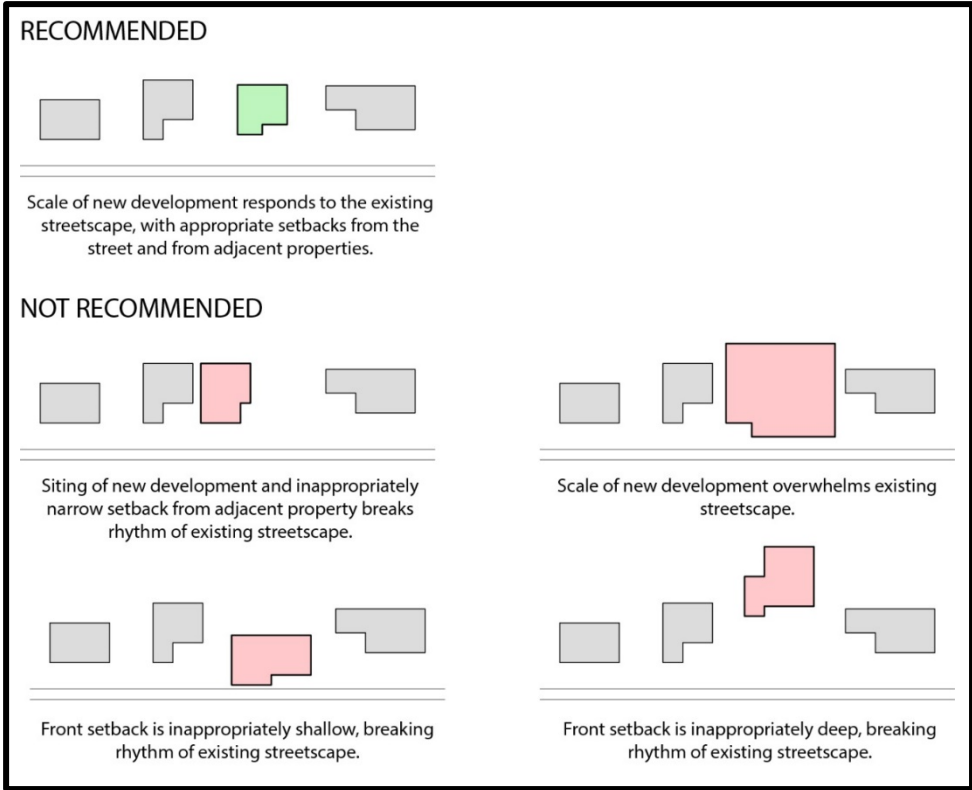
Guidelines for Siting New Development Within the Existing Streetscape
